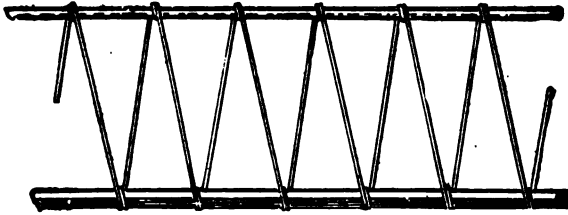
Beam Reinforcement of Pavin de Lafarge.
